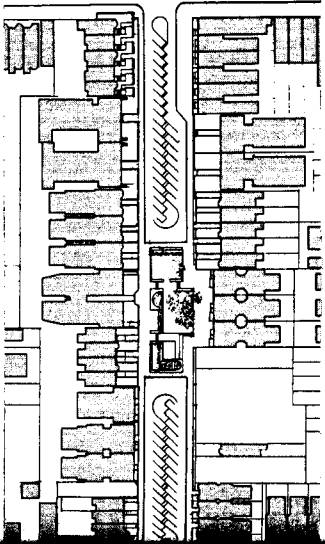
Site Plan of Saint Marks Avenue, New York City. Plan shows modifications to vehicular circulation and parking and provision of play and sitting areas.
